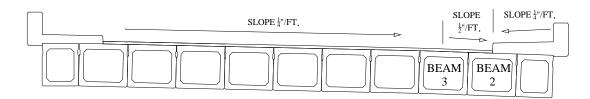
Location of Beams 2 & 3 in Section of Main Street Bridge
